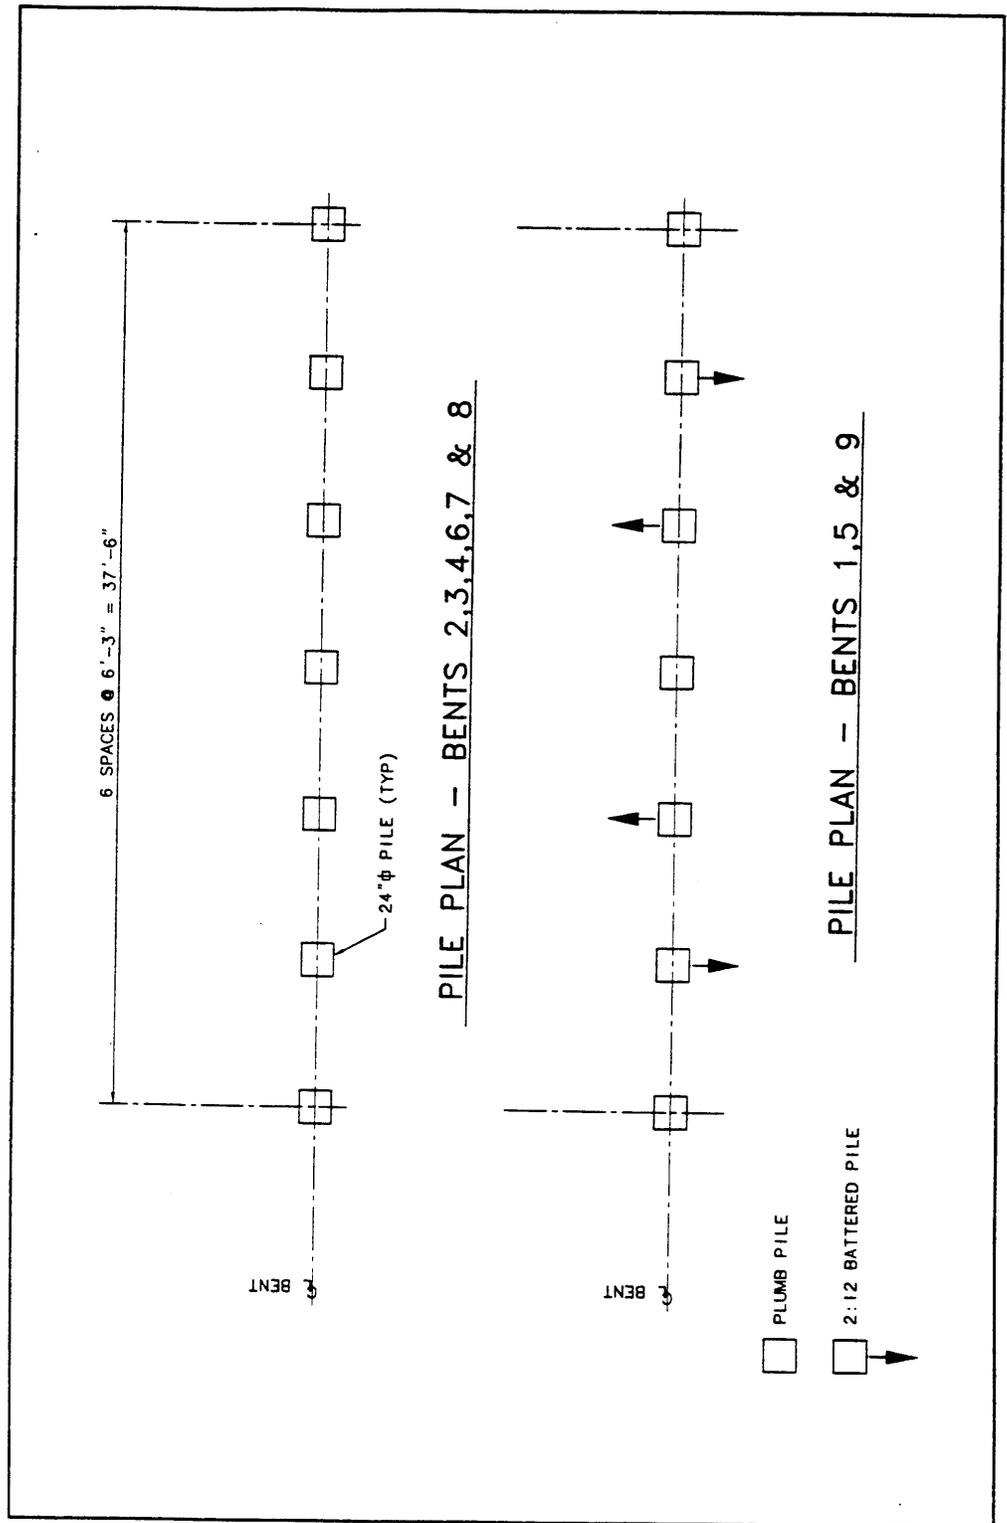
Bridge No. 7 - Pile Plan at Bents
